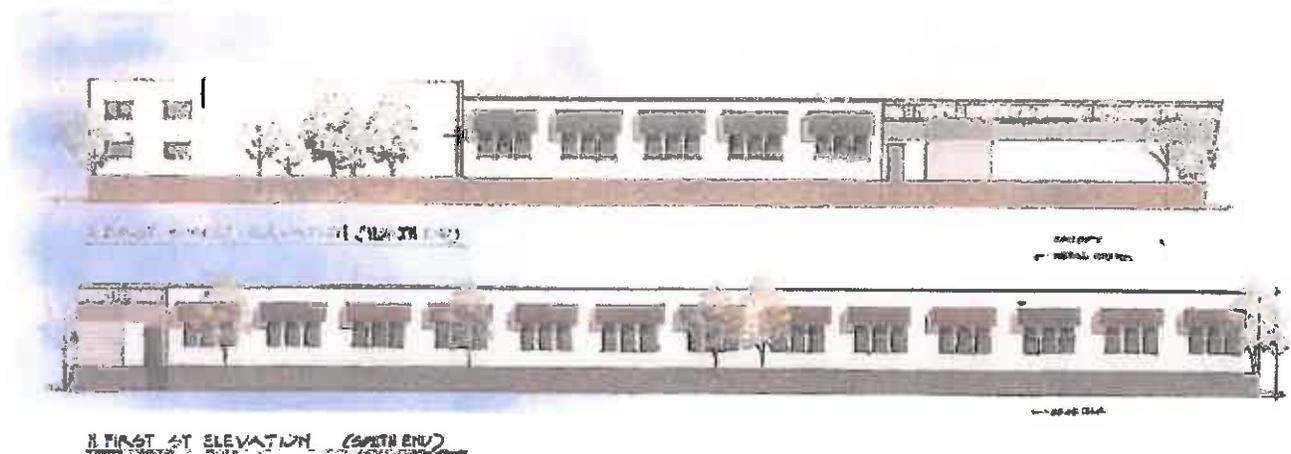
Initial Proposed Project Building Elevation, First Street View 218 N. First Street
